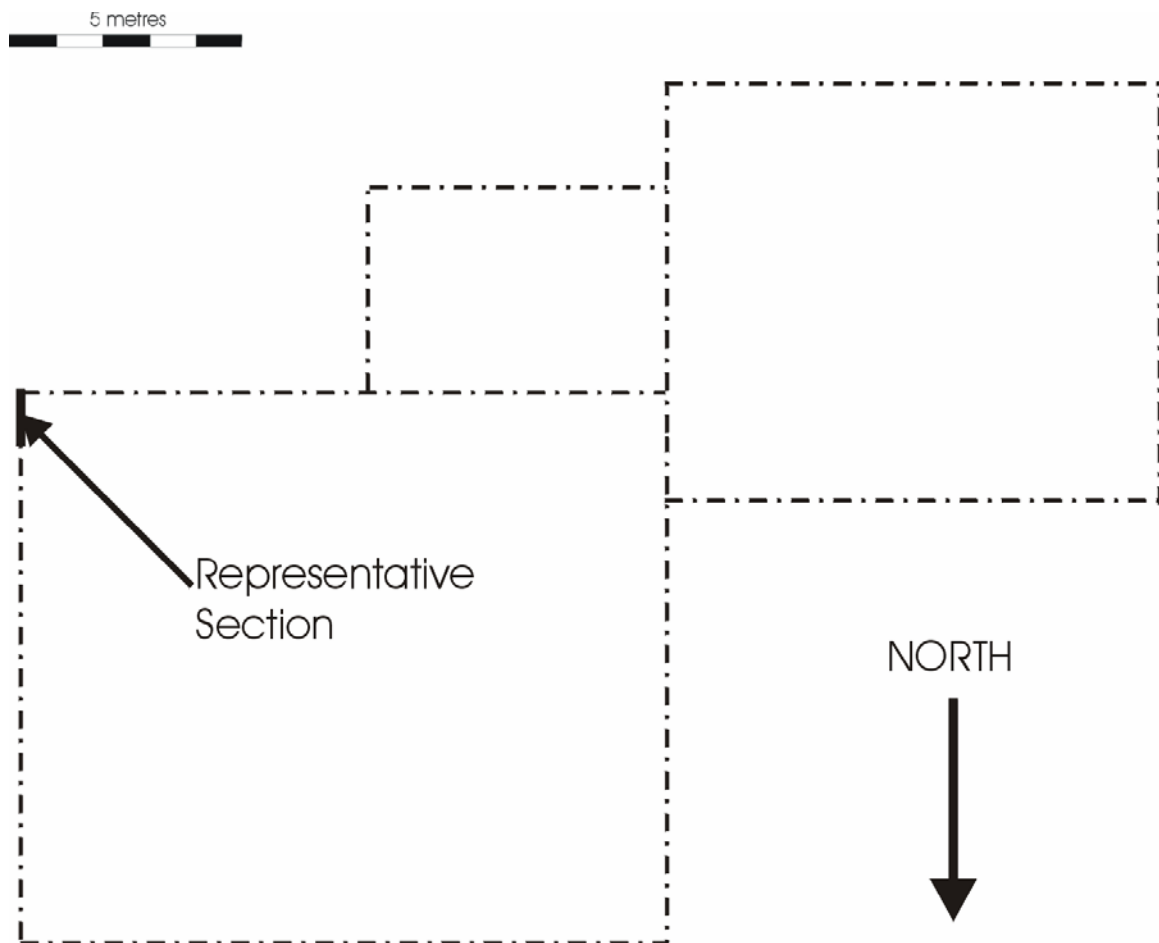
Plan of Groundworks at Eglingham with Situation of Representative Section Indicated
